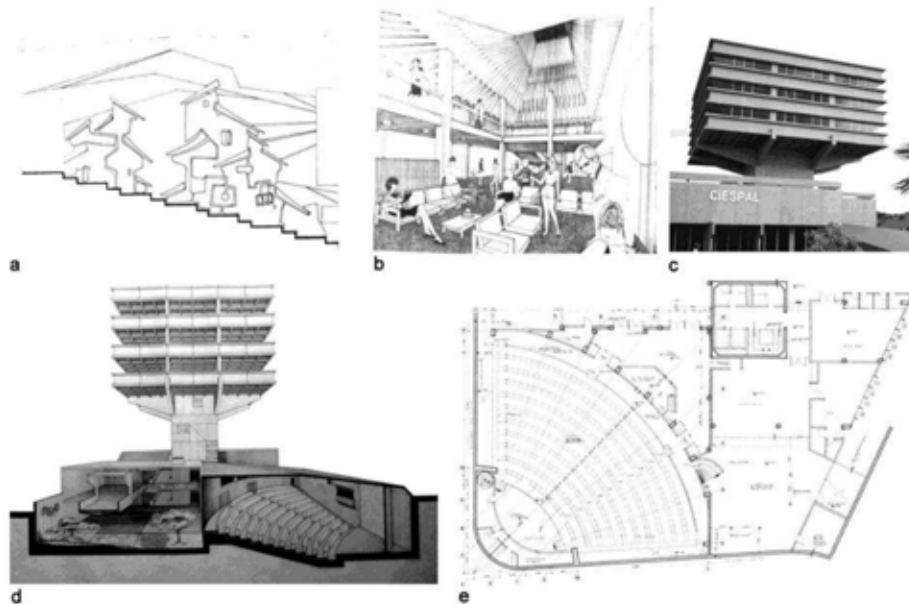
CIESPAL. a) Mural design for auditorium b) Interior view c) Photography from Almagro Street d) Section e) Auditorium plan⁴
